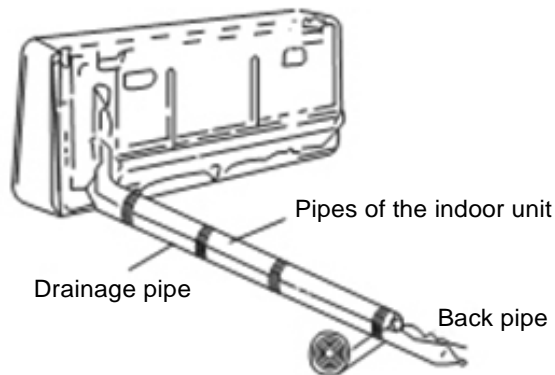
4 : Installation of the condensate pipe for Wall -mounted Type
